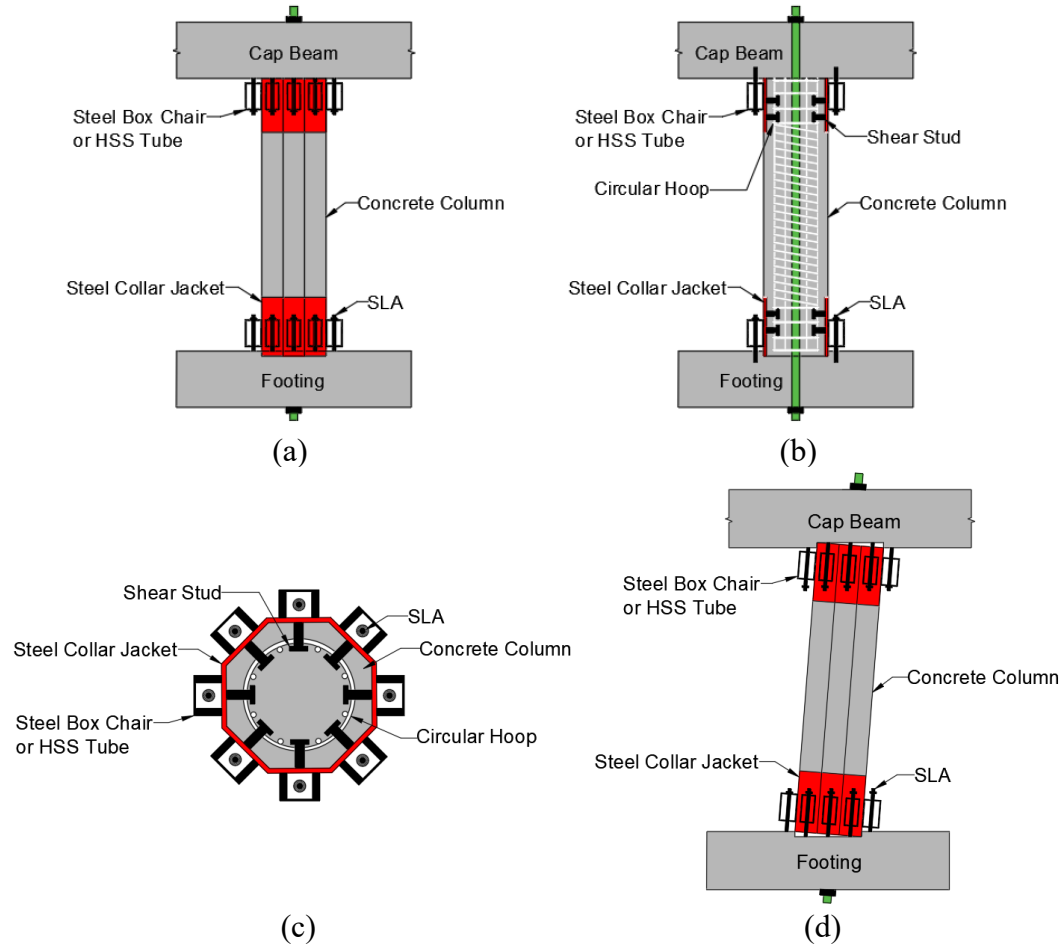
Bridge column with SLAs: (a) exterior; (b) interior; (c) section at SLAs; (d) rocking.
